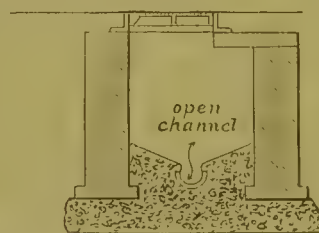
SECTION OF INSPECTION CHAMBER.
